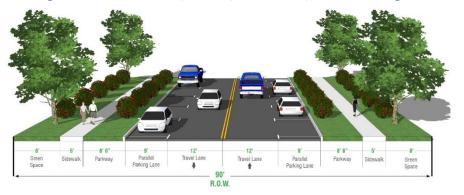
Collector - 2 Lanes, 90' ROW, 12-Foot Lanes, On-Street Parking
